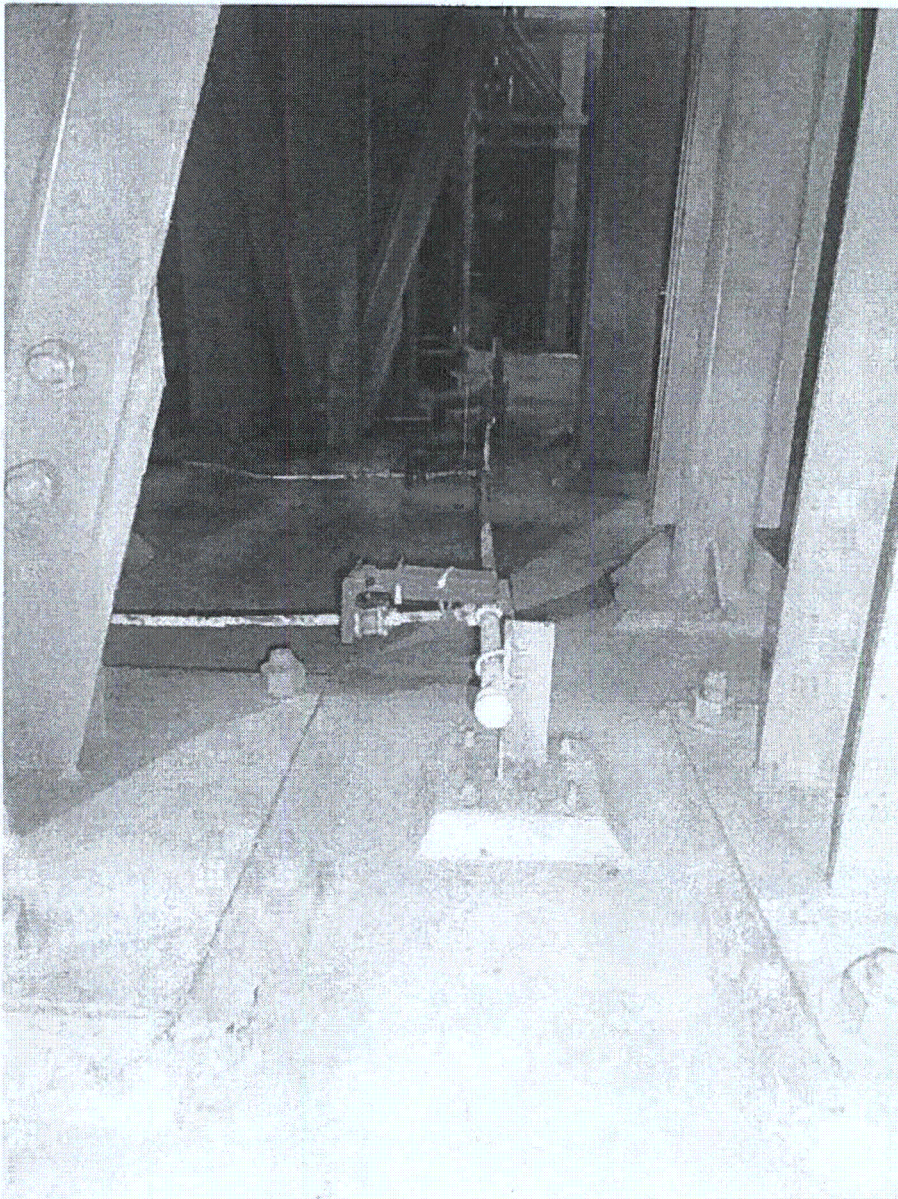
Air Line to Valve 1Z41-F009B at Floor Level showing additional Pipe Supports
